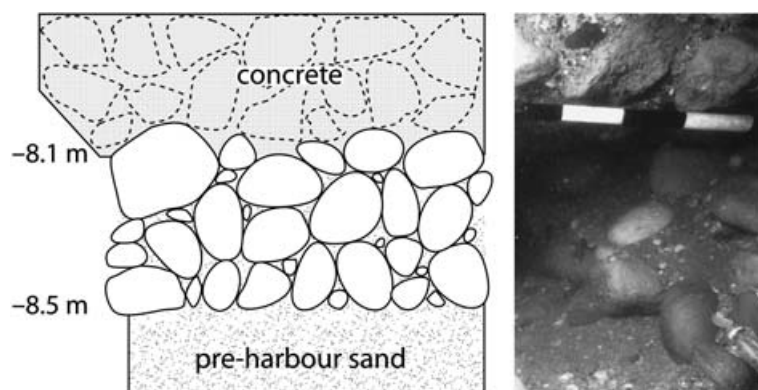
The cobble foundation beneath the concrete element of Area CO. The photograph is of one side of the tunnel excavated beneath the concrete element, illustrating the foundation in situ. The scale-bar divisions are 10 cm. (Photograph by B. Goodman)
